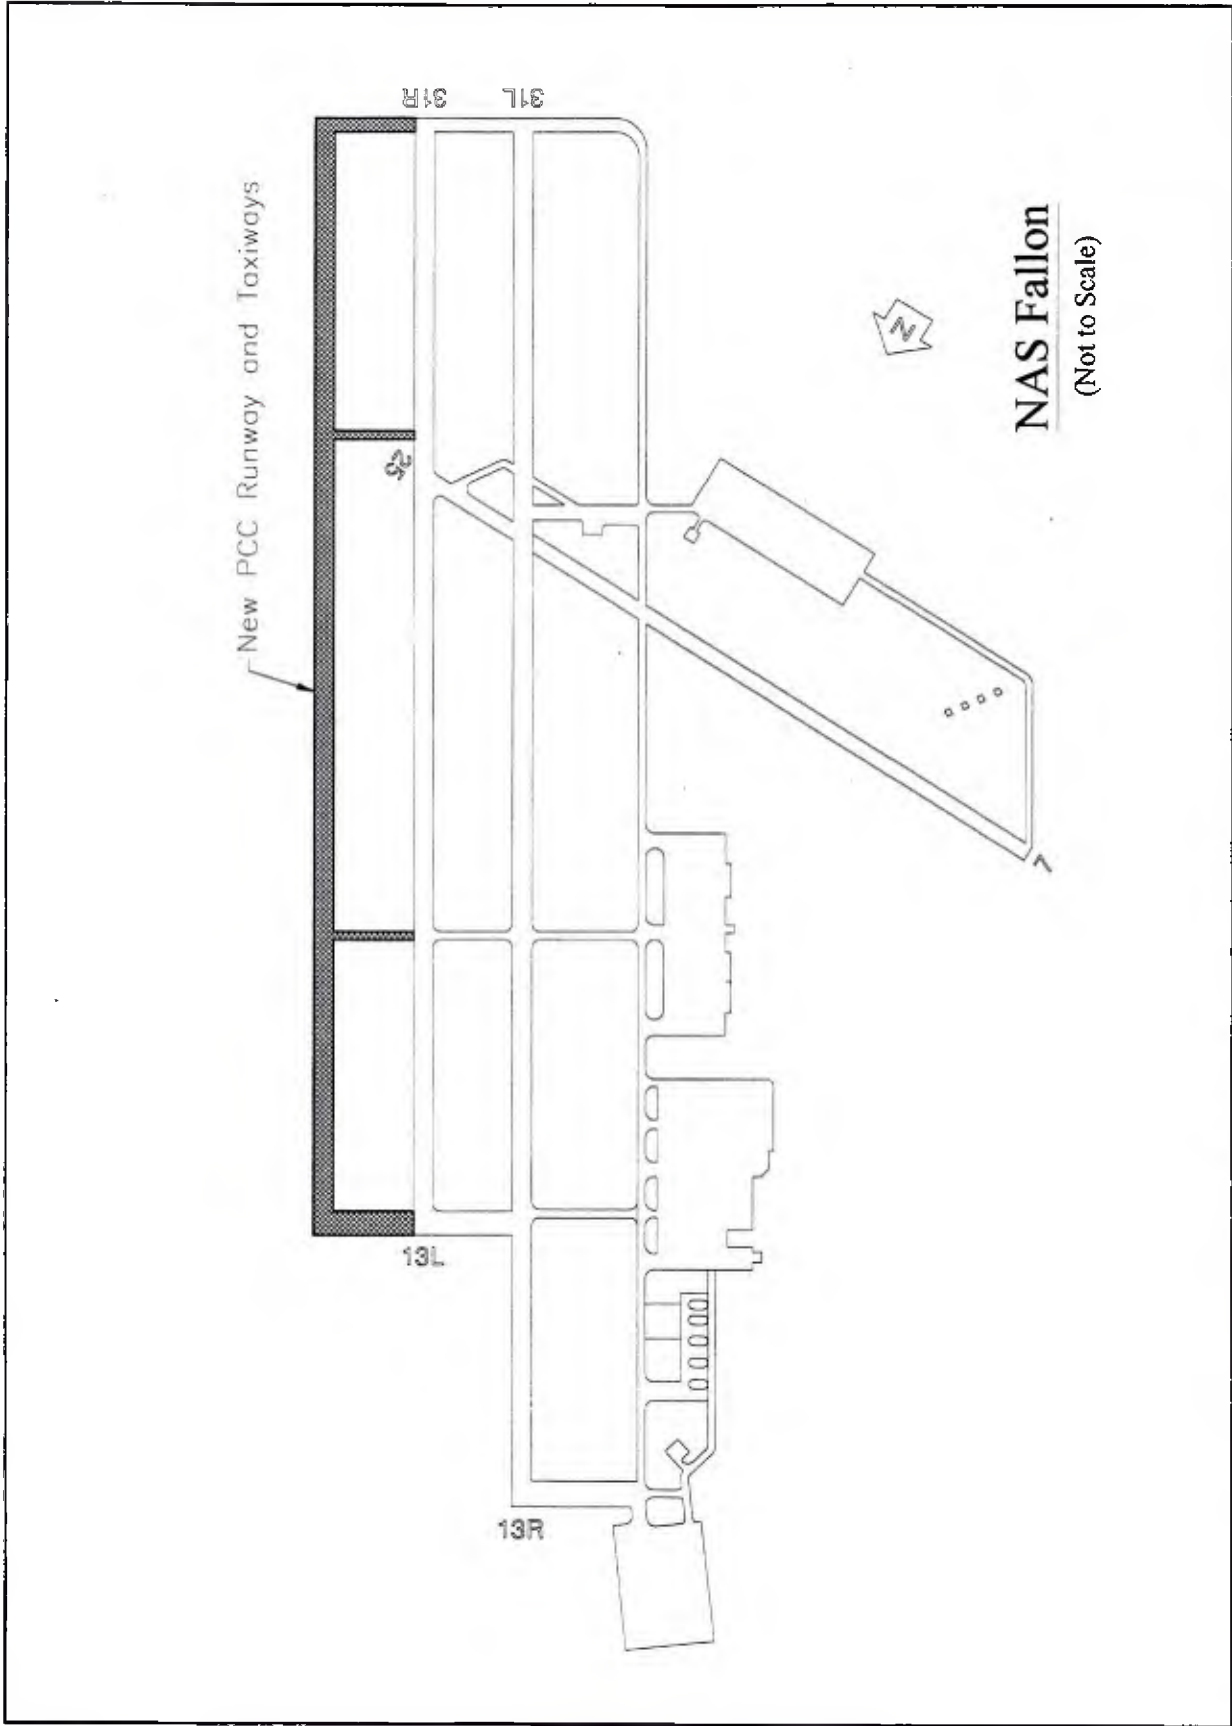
Layout of proposed new Portland cement concrete runway and taxiways.
